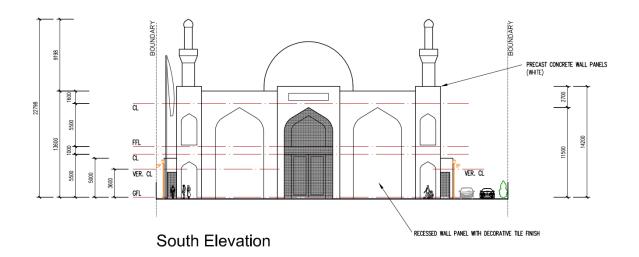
Approved Mosque Building (Note: East elevation facing Bridge Road)
